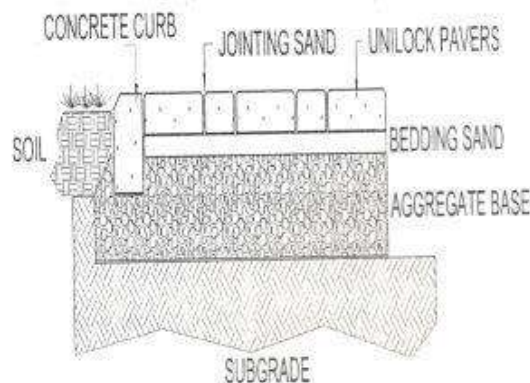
Typical Cross Section of Interlocking Concrete Pavement
